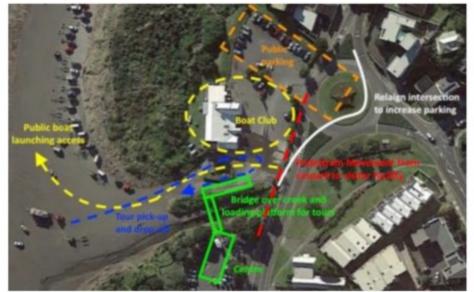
The proposed new site layout as recommended within the 2020 Gateway Feasibility Report.
